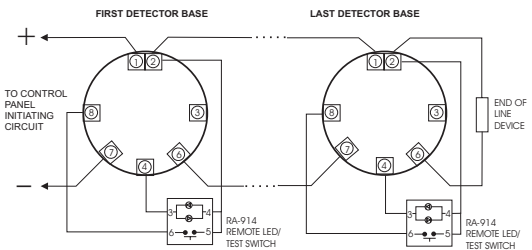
2WRLT/2WRLTC Wiring with Remote Indicator and Test Switch
